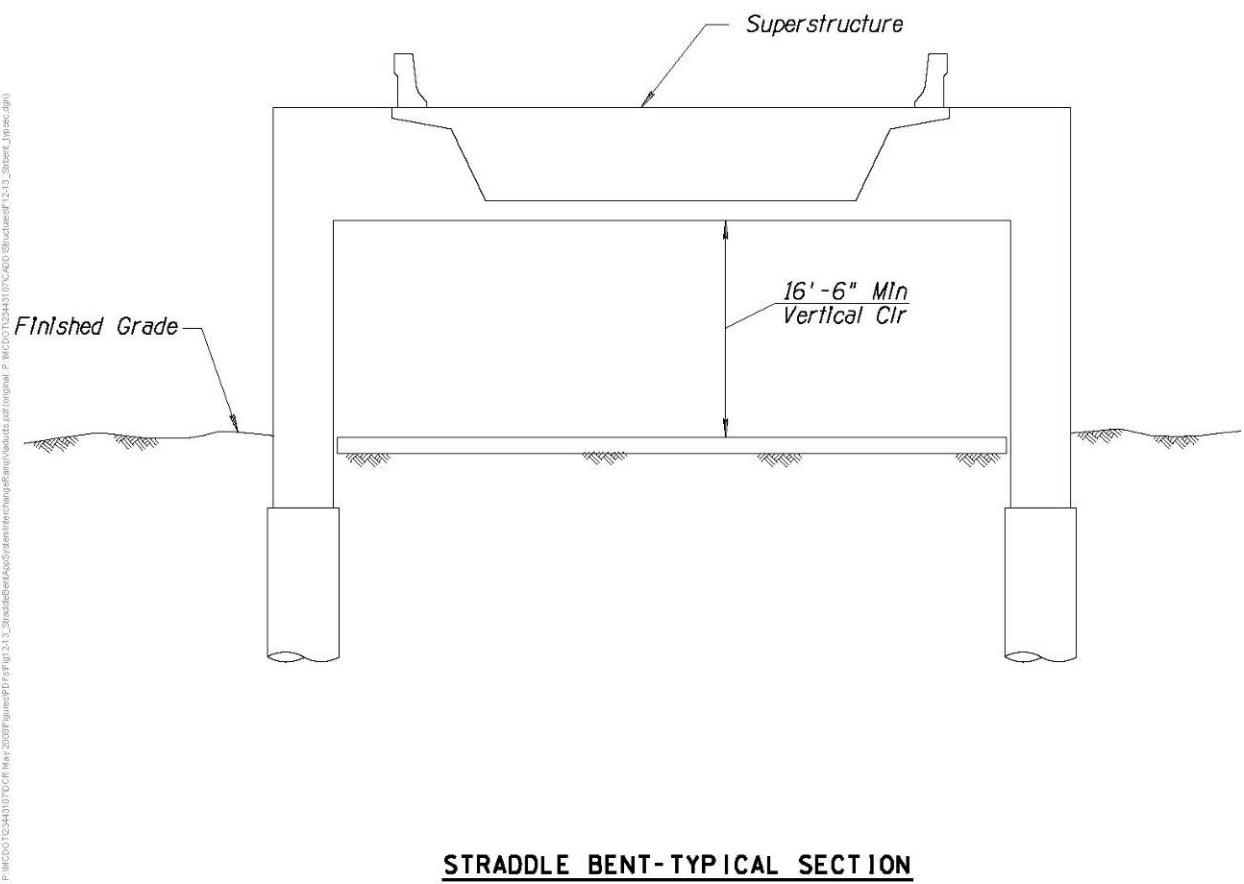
Potential Straddle Bent Application on System Interchange Ramp Viaducts
